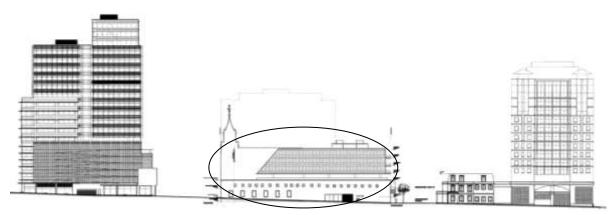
Bree Street elevation of the proposal shown in relation to its surroundings
